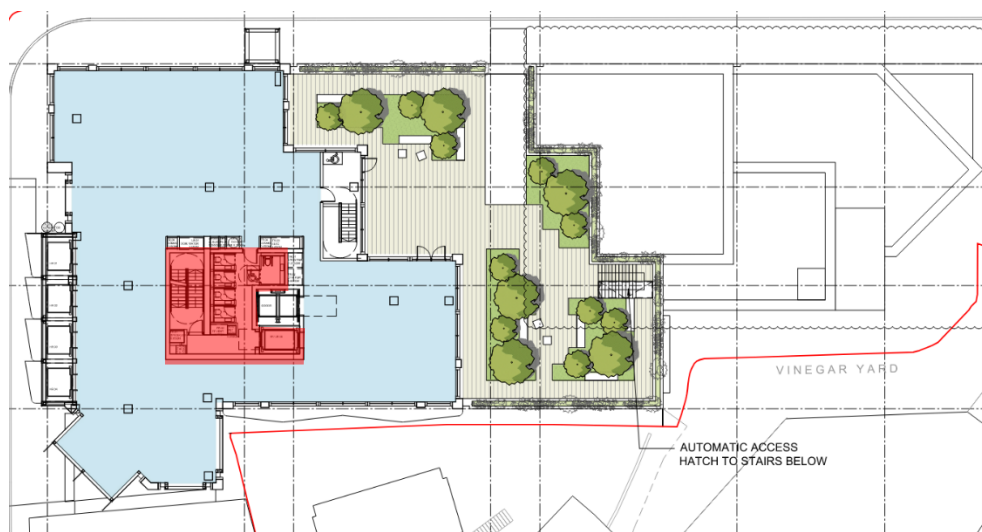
Illustrating one fire fighting shaft and escape stair that transfers via the roof terrace
